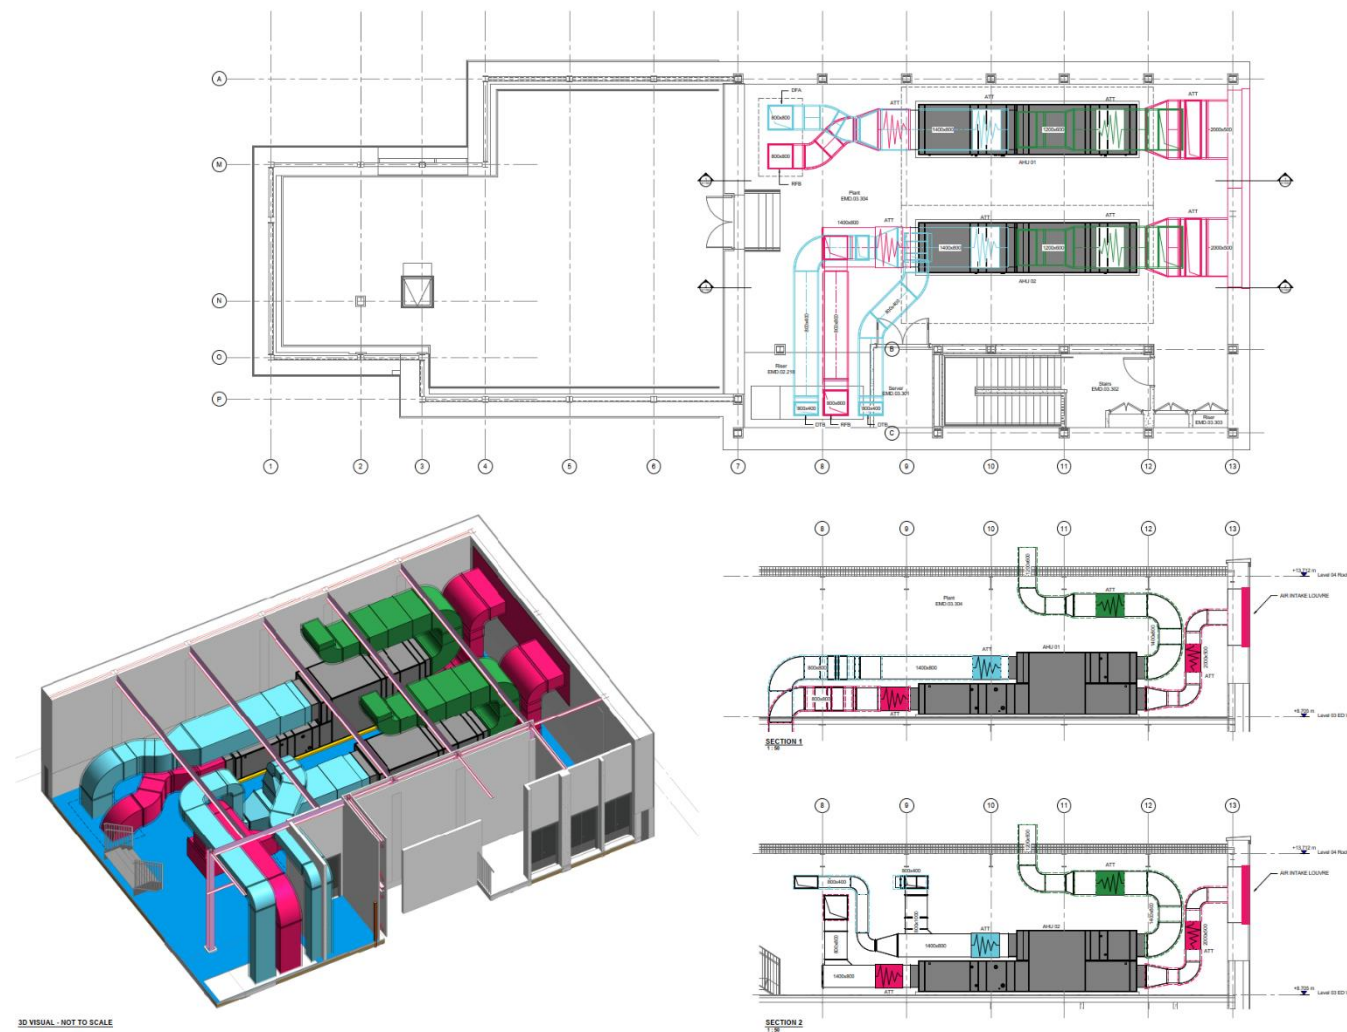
L3 Mechanical Ventilation Layout (N.T.S.)
